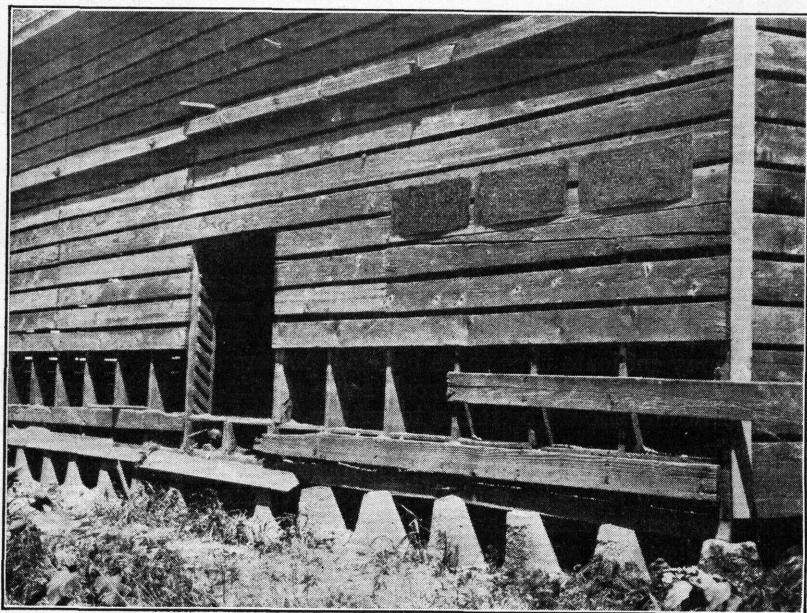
Shallow piers make an unstable foundation. About one-third of these are out of alignment
